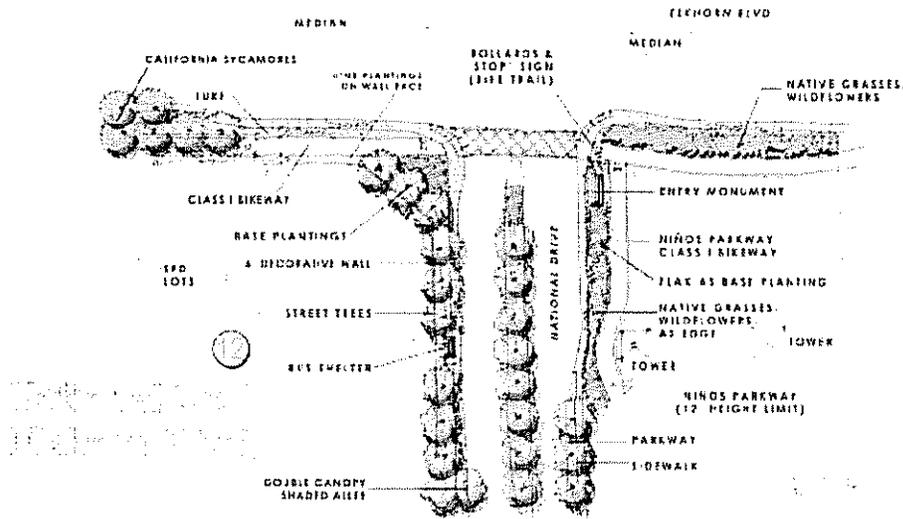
Schematic Landscape Plan 12. National Drive and Elkhorn Boulevard.
